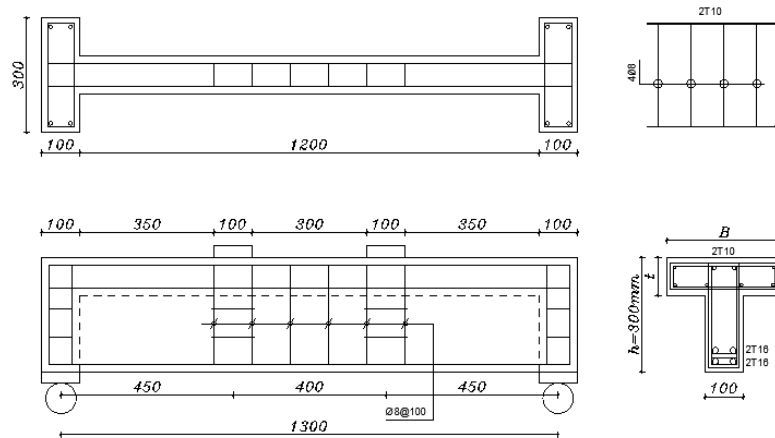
Specimen details and arrangement of reinforcement (All dimensions in mm) [16]
